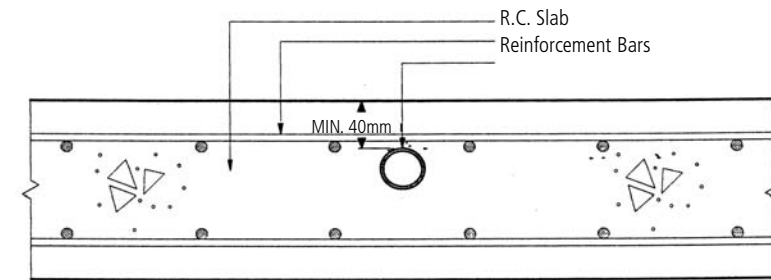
PIPING EMBEDDED IN CONCRETE FLOOR
